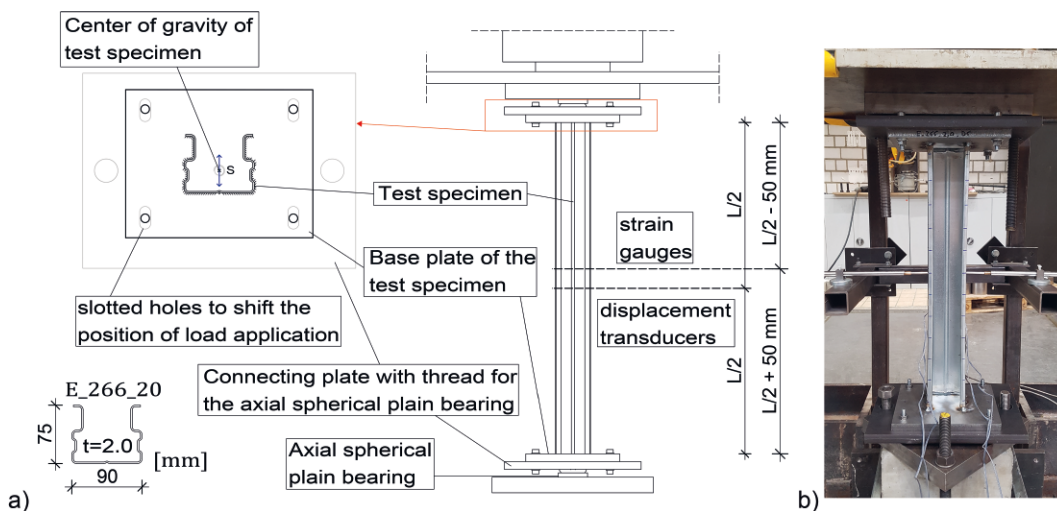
Test setup of the compression tests: a) construction sketch with realization of the load application; b)  $\Omega$ -shaped cross-section E\_288\_20 in the test setup
